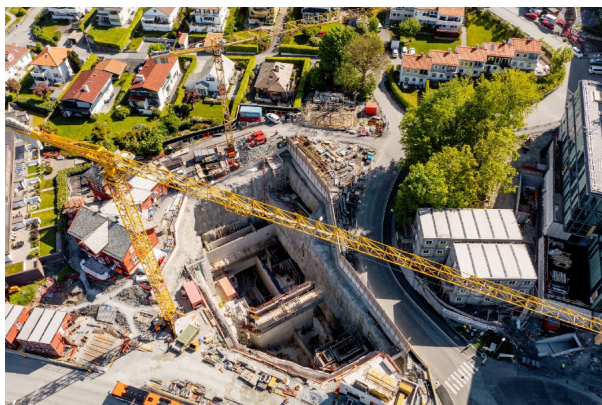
Opening the Underground Space for Haukeland Station, part of the Bergen Light Rail (Bybane Bergen) (Photo: Pixel & Co).
